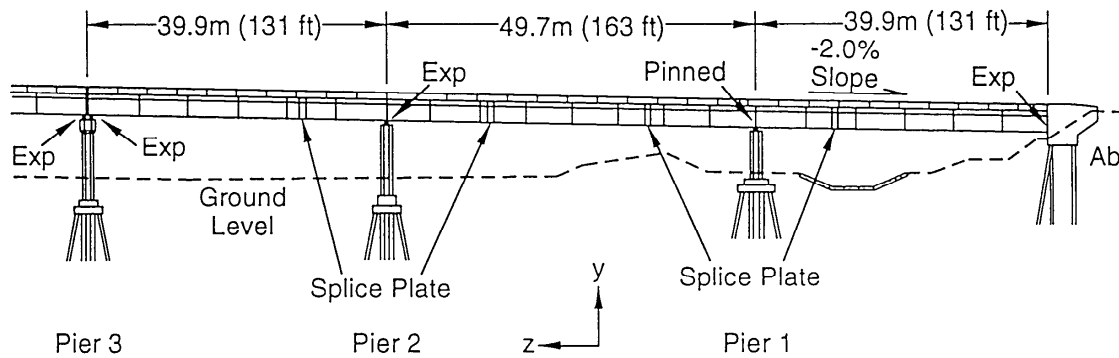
Elevation view of the portion of the I-40 Bridge that was tested.
